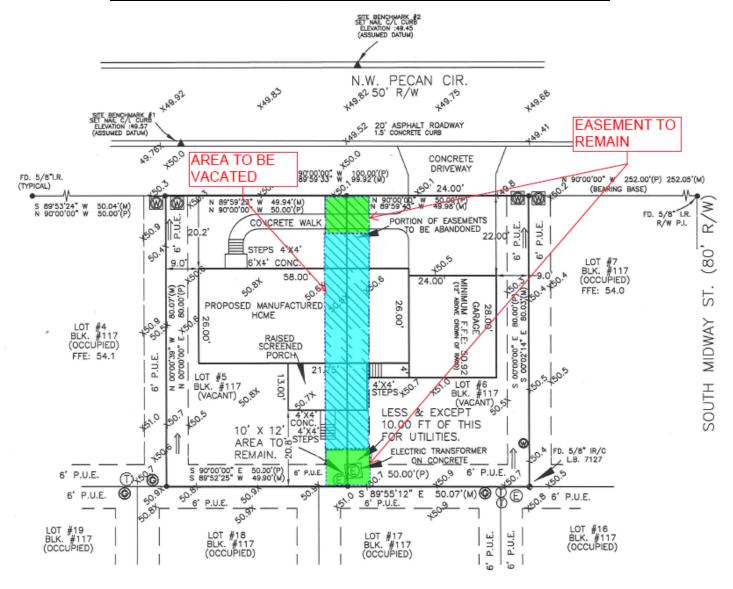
Petitioner's Proposed Plot Plan for new home on lots 5 & 6, Block 117, Barefoot Bay.
